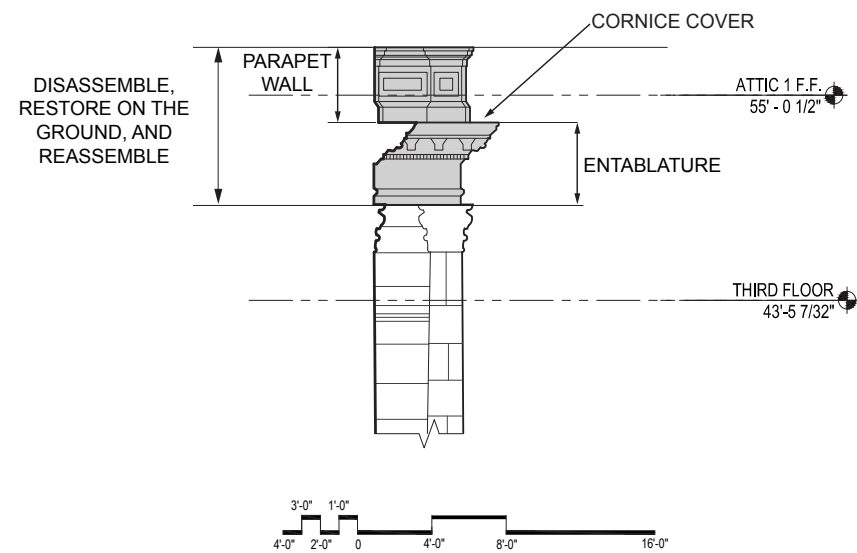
Treatment Approach at Parapet Walls.
